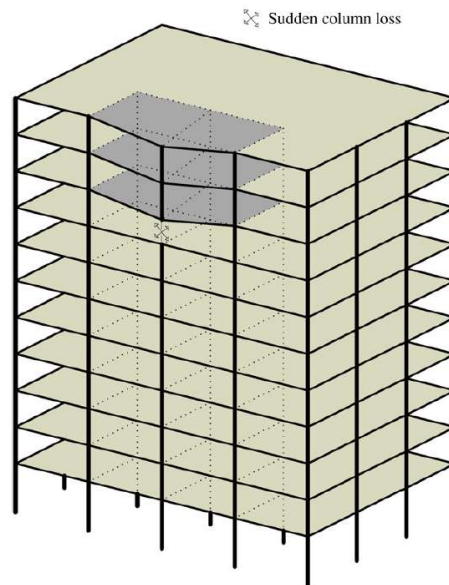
Multi-storey building subjected to sudden column loss (Izzuddin et al., 2008)
